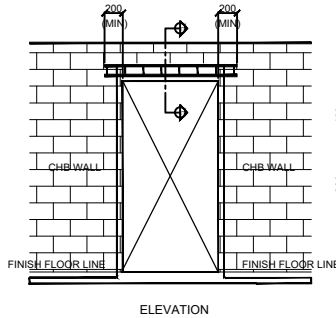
TYPICAL DETAIL OF LINTEL BEAM AT CHB WALL OPENING
